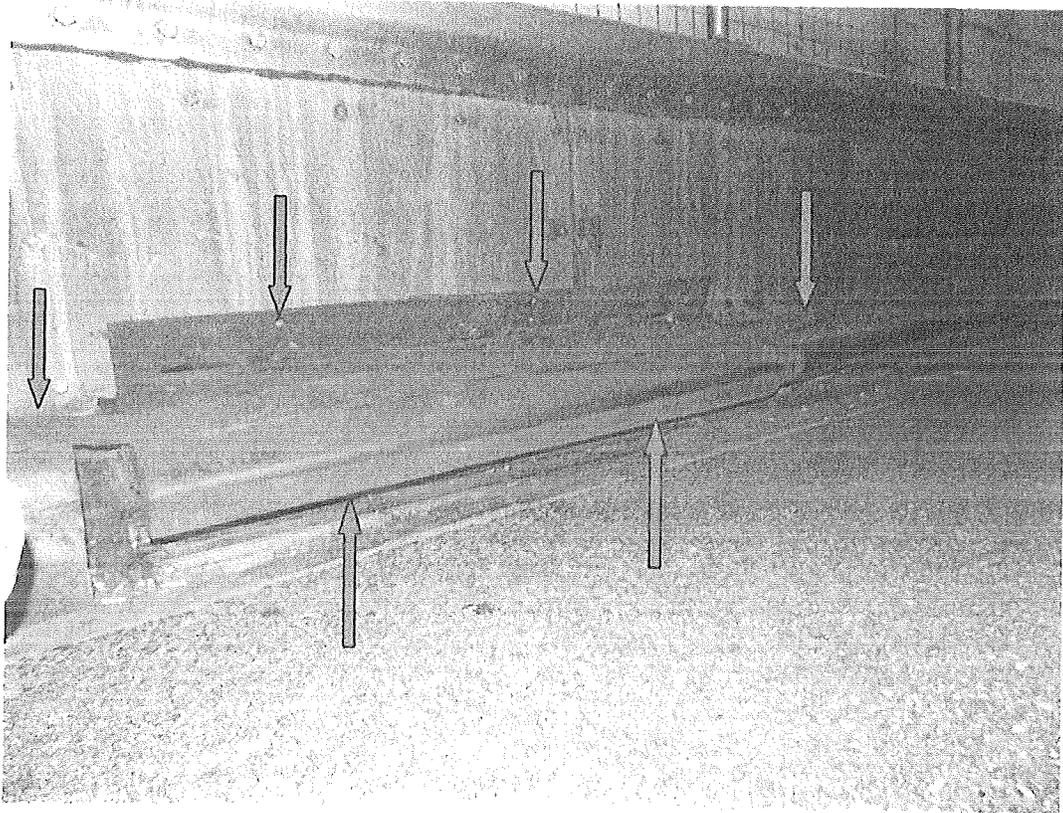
South Tunnel – Roadway – Station 83+50 to 83+55 – Approximately 5 ft. long section of unsecured curb resting on adjacent curbing.
